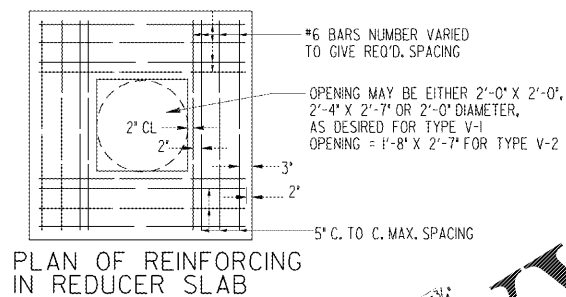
DETAIL OF REDUCING W1 OR W2 DIMENSIONS WITH REDUCER SLAB.
